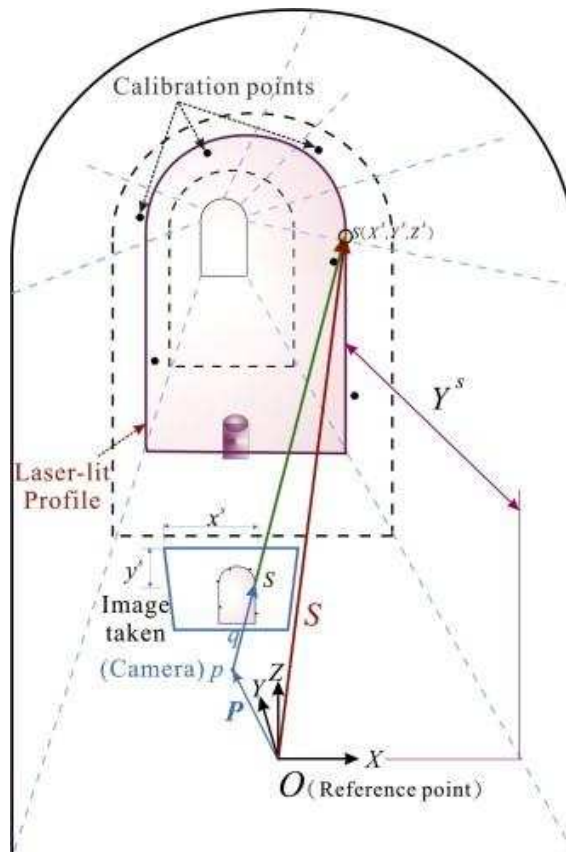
Illustration of imaging geometry of profile-image method for the tunnel wall (Wang et al., 2010)
